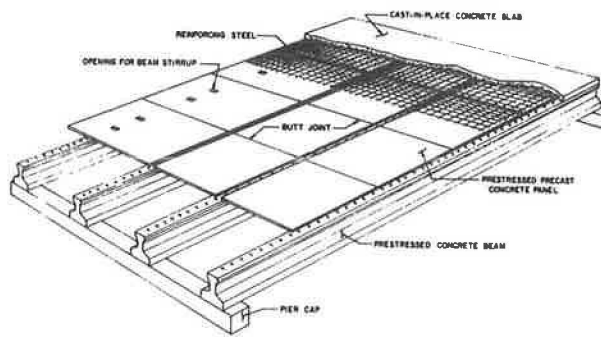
Full size prestressed concrete beam span with panel deck tested at the University of Texas.
